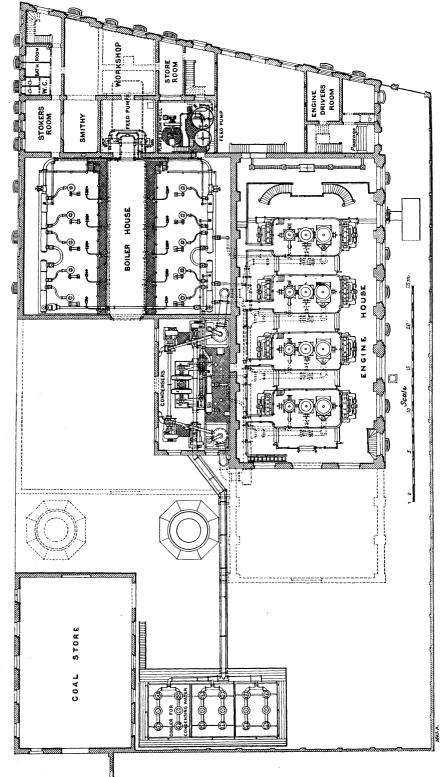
PLAN OF HAMBURG POWER HOUSE.
